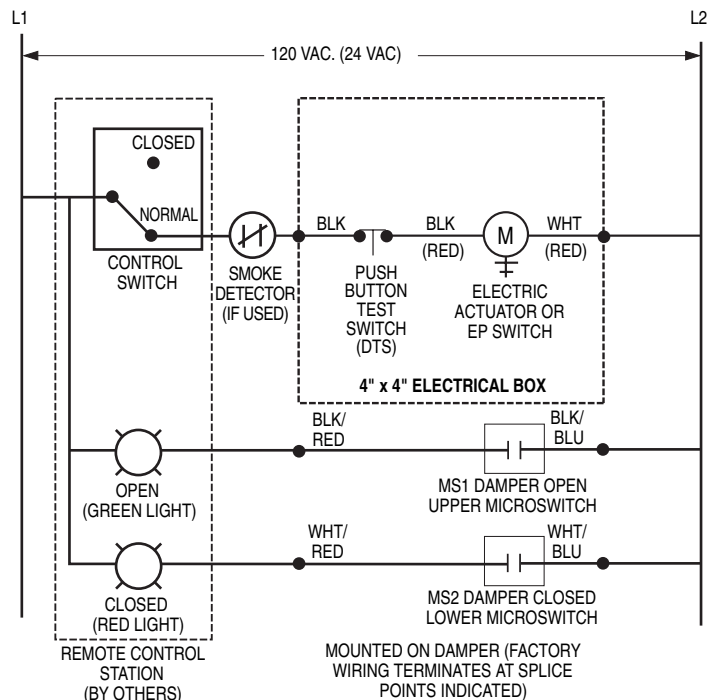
DTS with electric actuator and MLS-300 Position Indicator Package (Honeywell rotary cam type) on smoke damper
